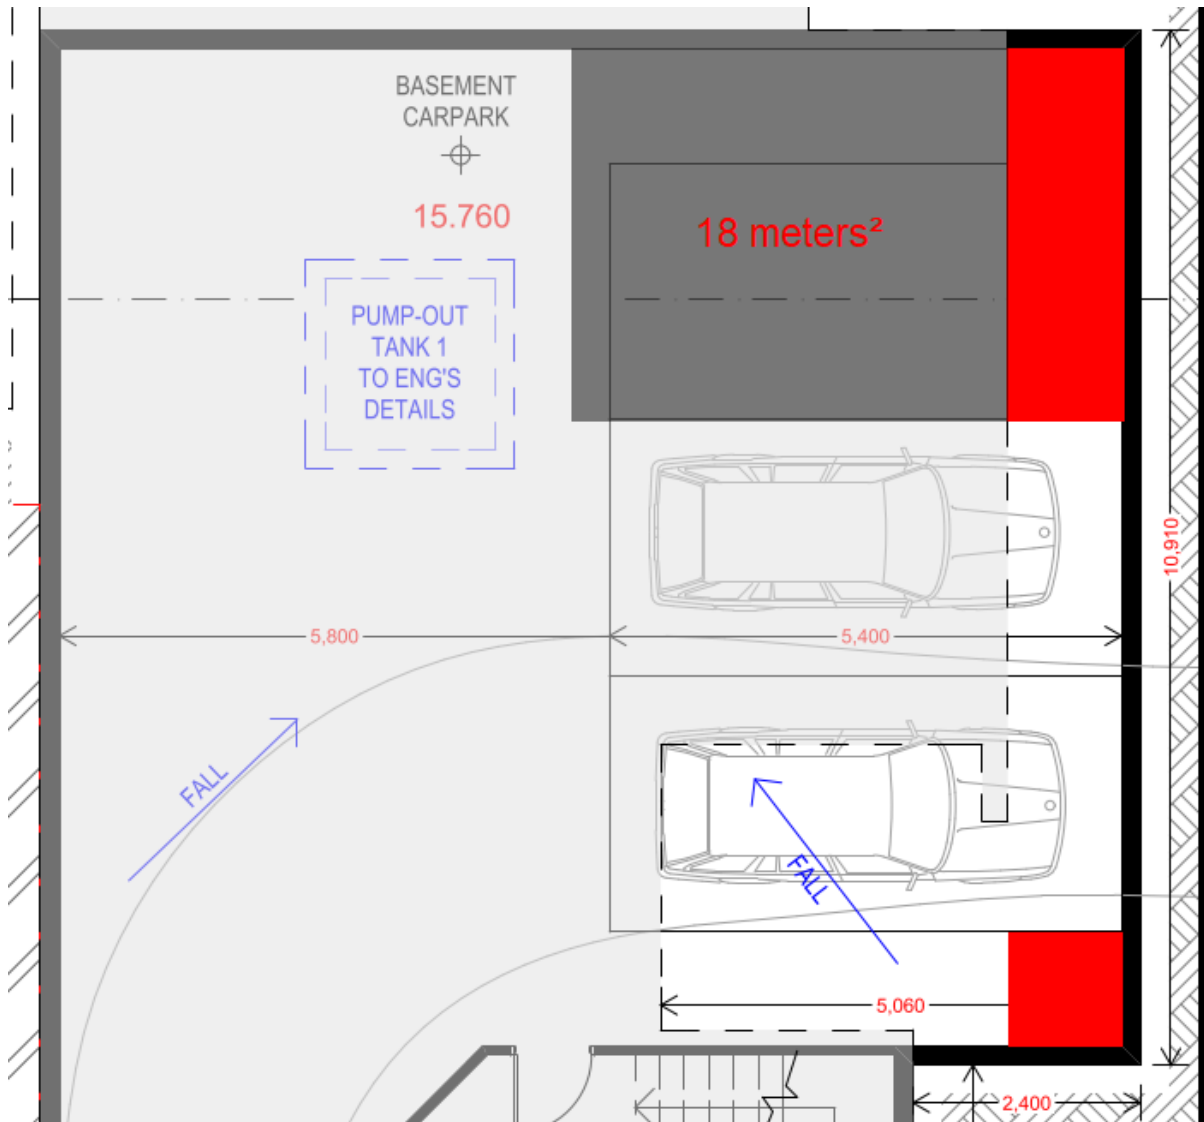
Marked-up image of the most recent proposed basement plan. Red area to be deleted, shaded area in grey to be added in the FSR calculation.
